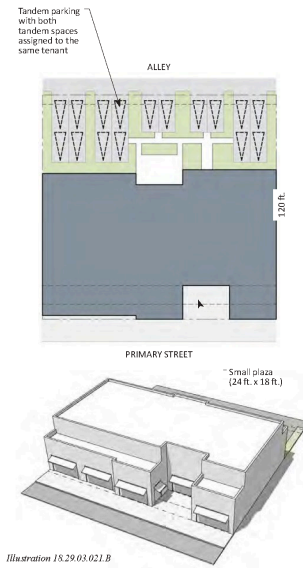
B: Lot diagram and bird's-eye view perspective of a main street wide building form type.
